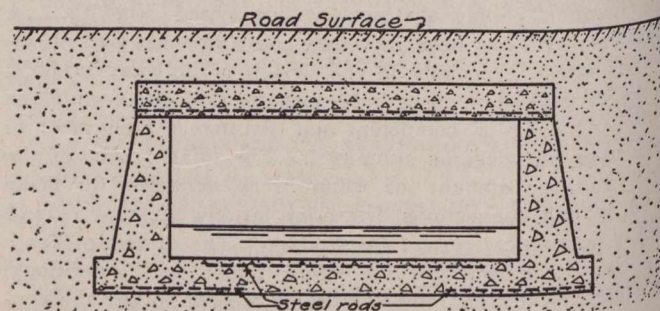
Reinforced Concrete Floor, for Distributing Pressure Over a Greater Area and for Protecting Foundation from Erosion.
